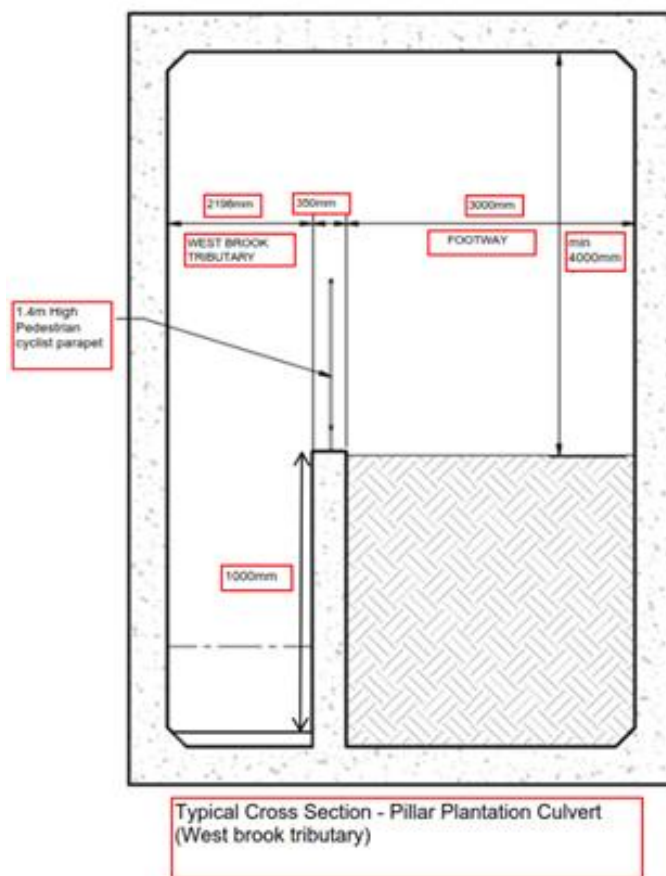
West Brook Proposed A428 Culvert (dimensions not to scale)
